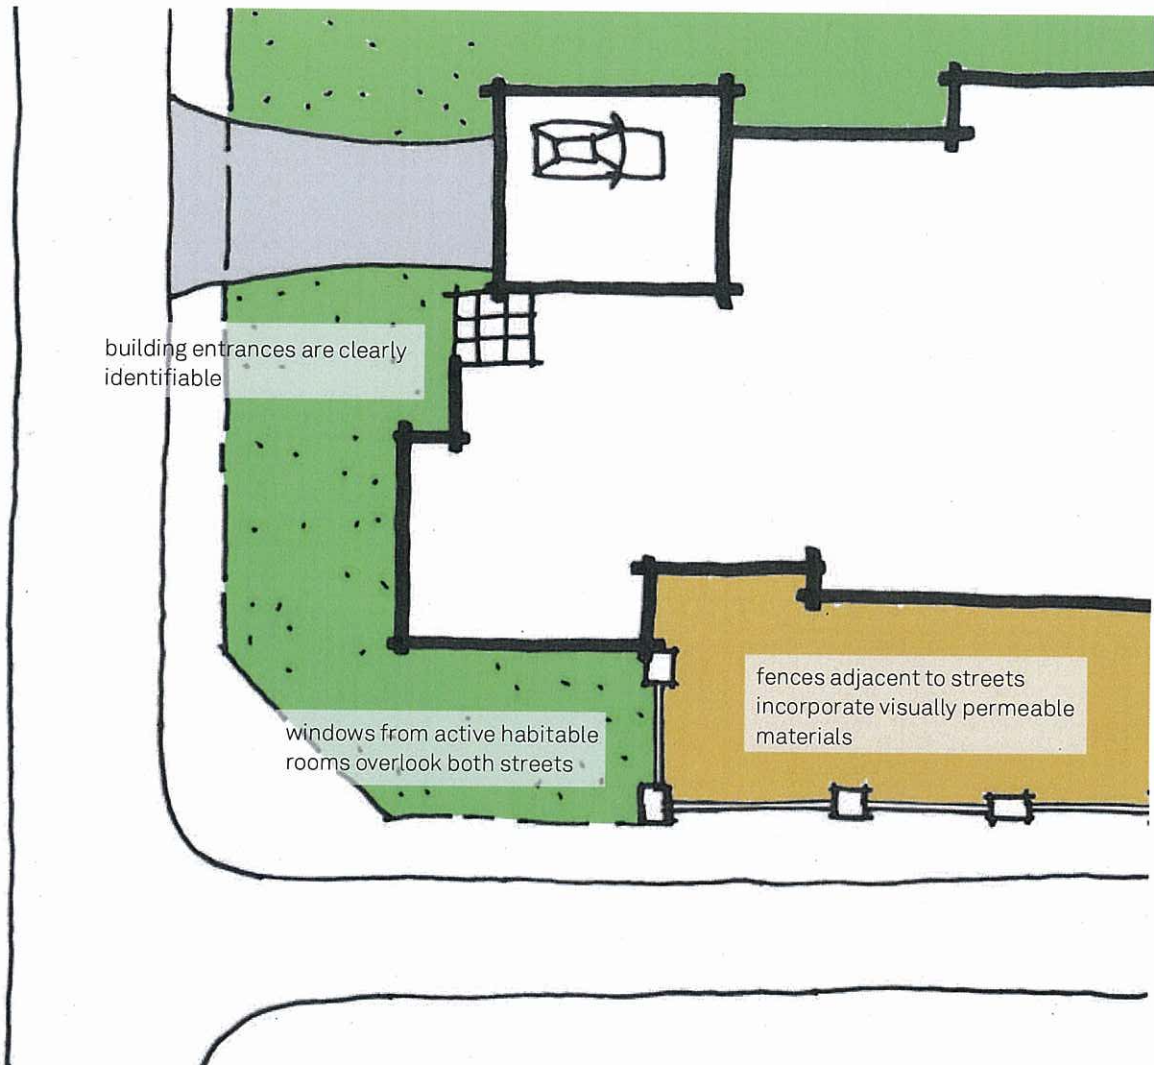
Dwellings and other development on corner site should address both streets, as demonstrated in this diagram.
